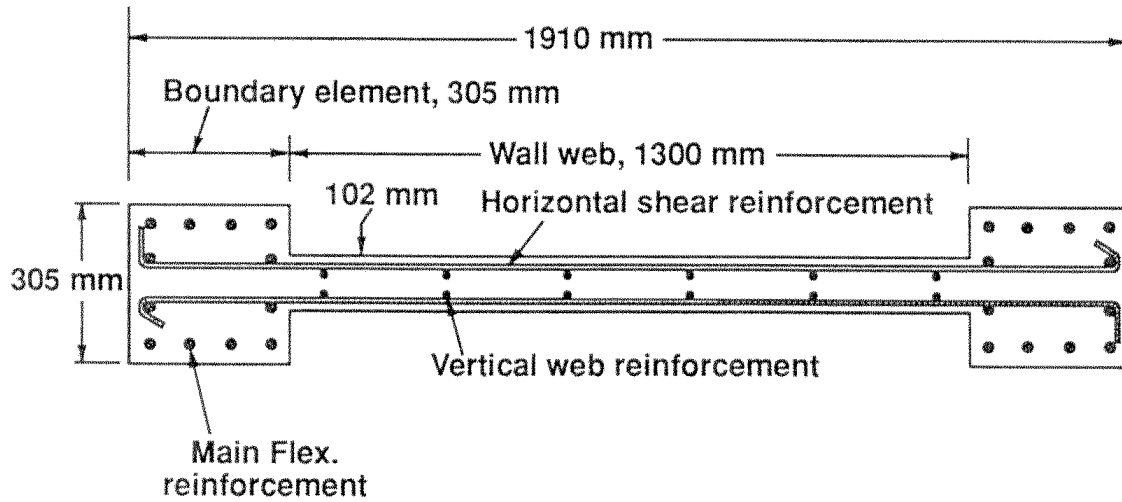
Typical Reinforcement Layout of PCA Walls, taken from Oesterle, Fiorato, Johal, Carpenter, Russell, and Corley<sup>30</sup>
